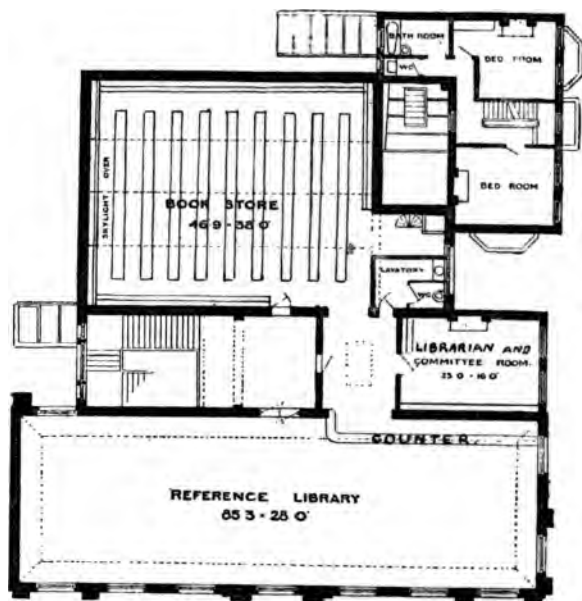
Plan of the first floor of the "Tate" Central Library, Brixton.
